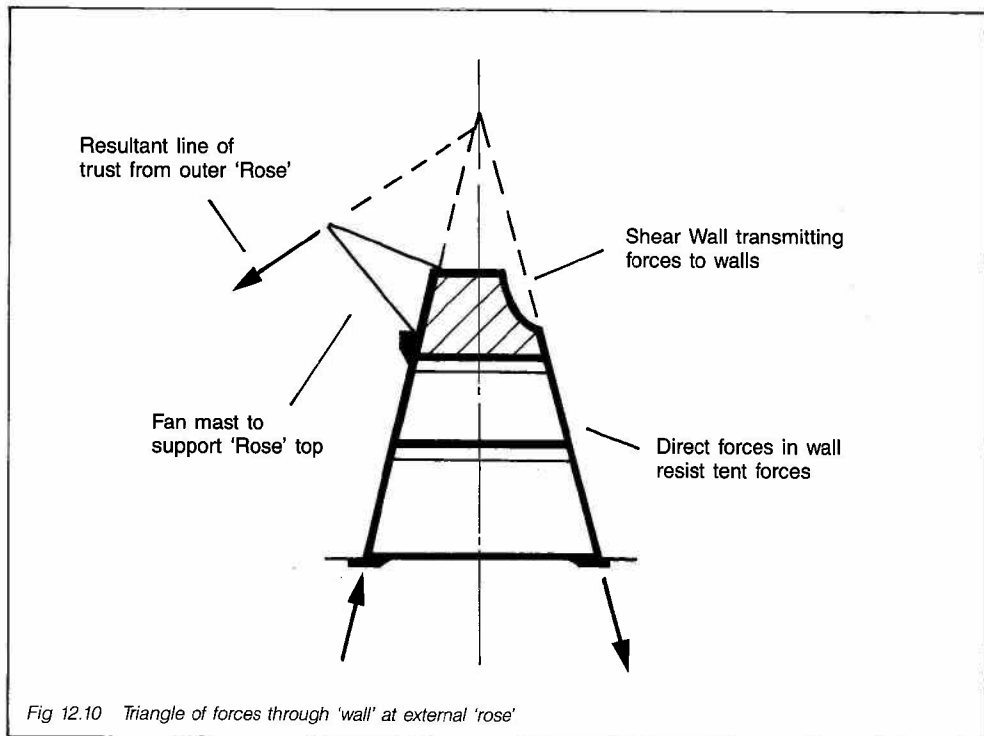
Triangle of forces through 'wall' at external 'rose'
